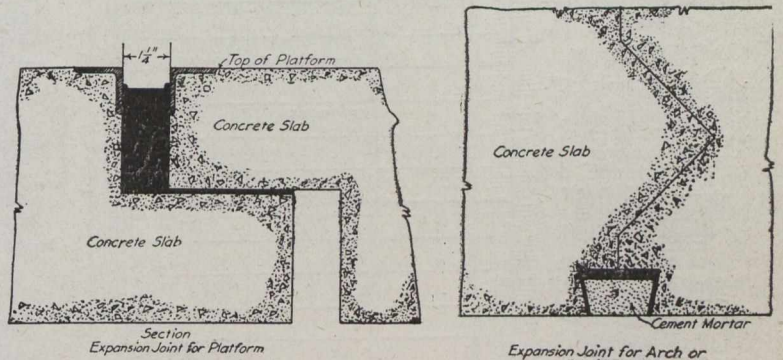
Expansion Joints for Platform and Arch or Retaining Wall.
